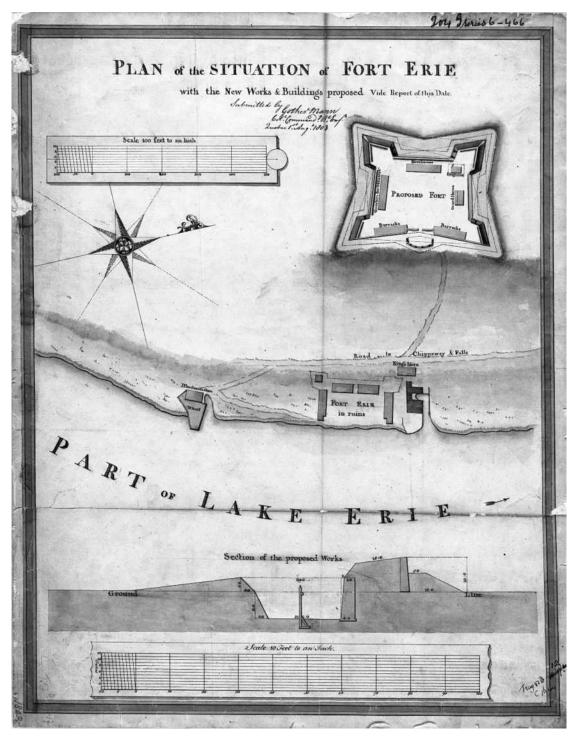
Plan of the Situation of Fort Erie with the New Works & Buildings proposed', Gother Mann, 1803.
